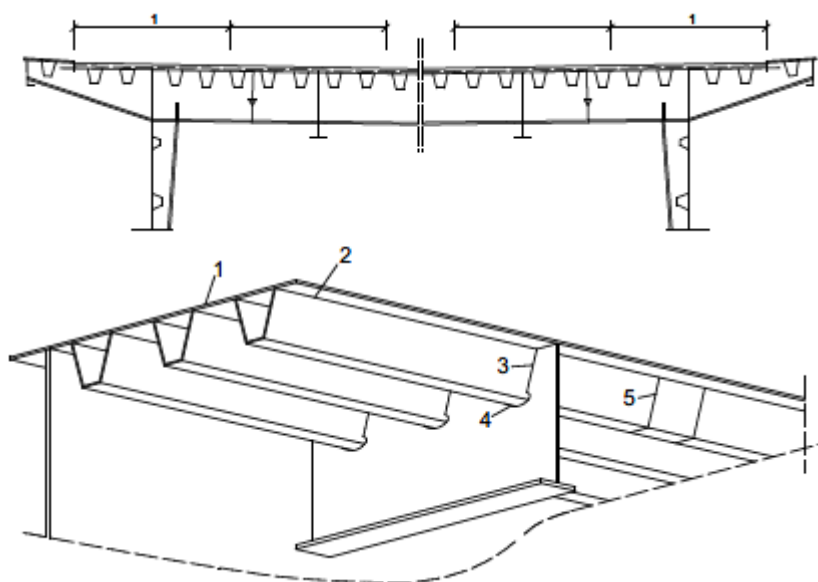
Standard OSD. 1. Deck plate, 2. Connection trough web to deck plate, 3. Connection trough web to crossbeam, 4. Cope hole, 5. Splice joint connection [30, fig. C.1]
